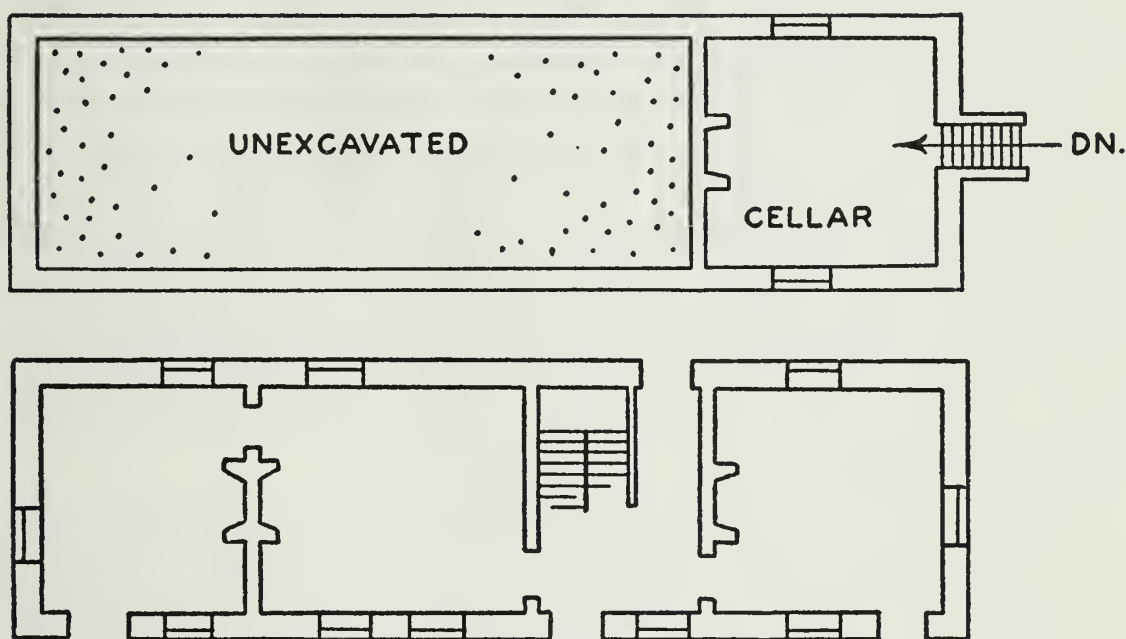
Building C, Officers Quarters, cellar and main floor plans, 1834.
